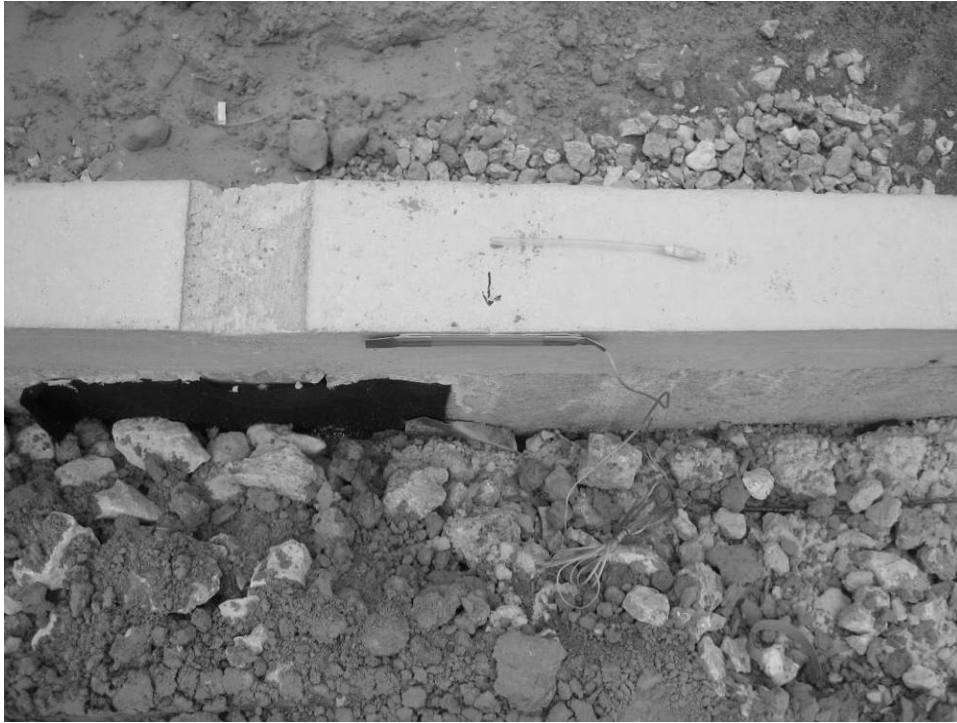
Install Tape Switches on Inside Face of Wall Panels/Level Up Concrete
